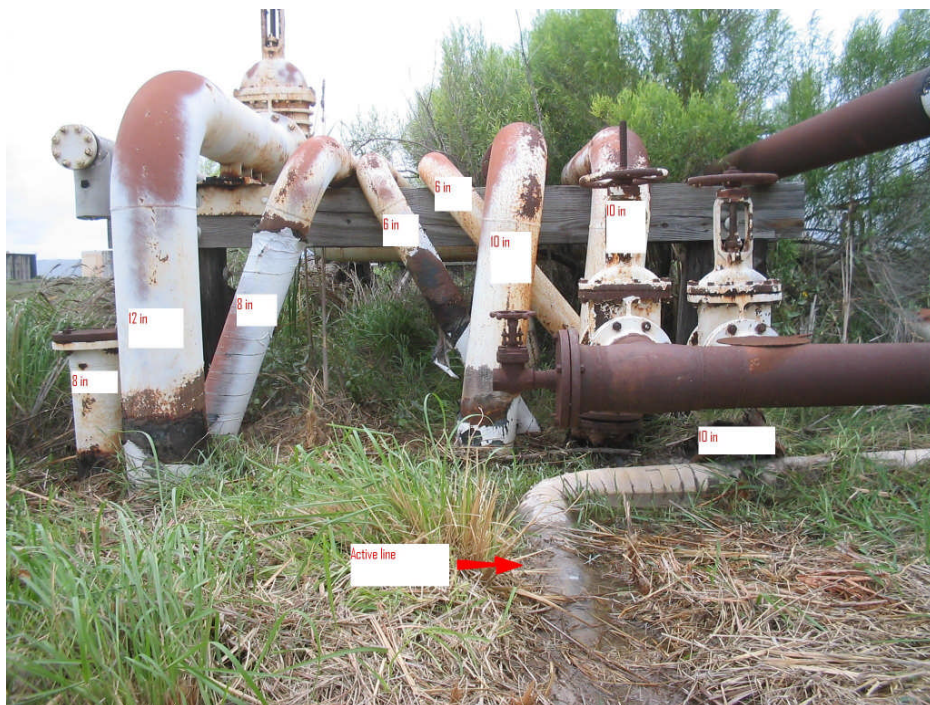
Diameters of pipelines that go underground at Bishop Road.
